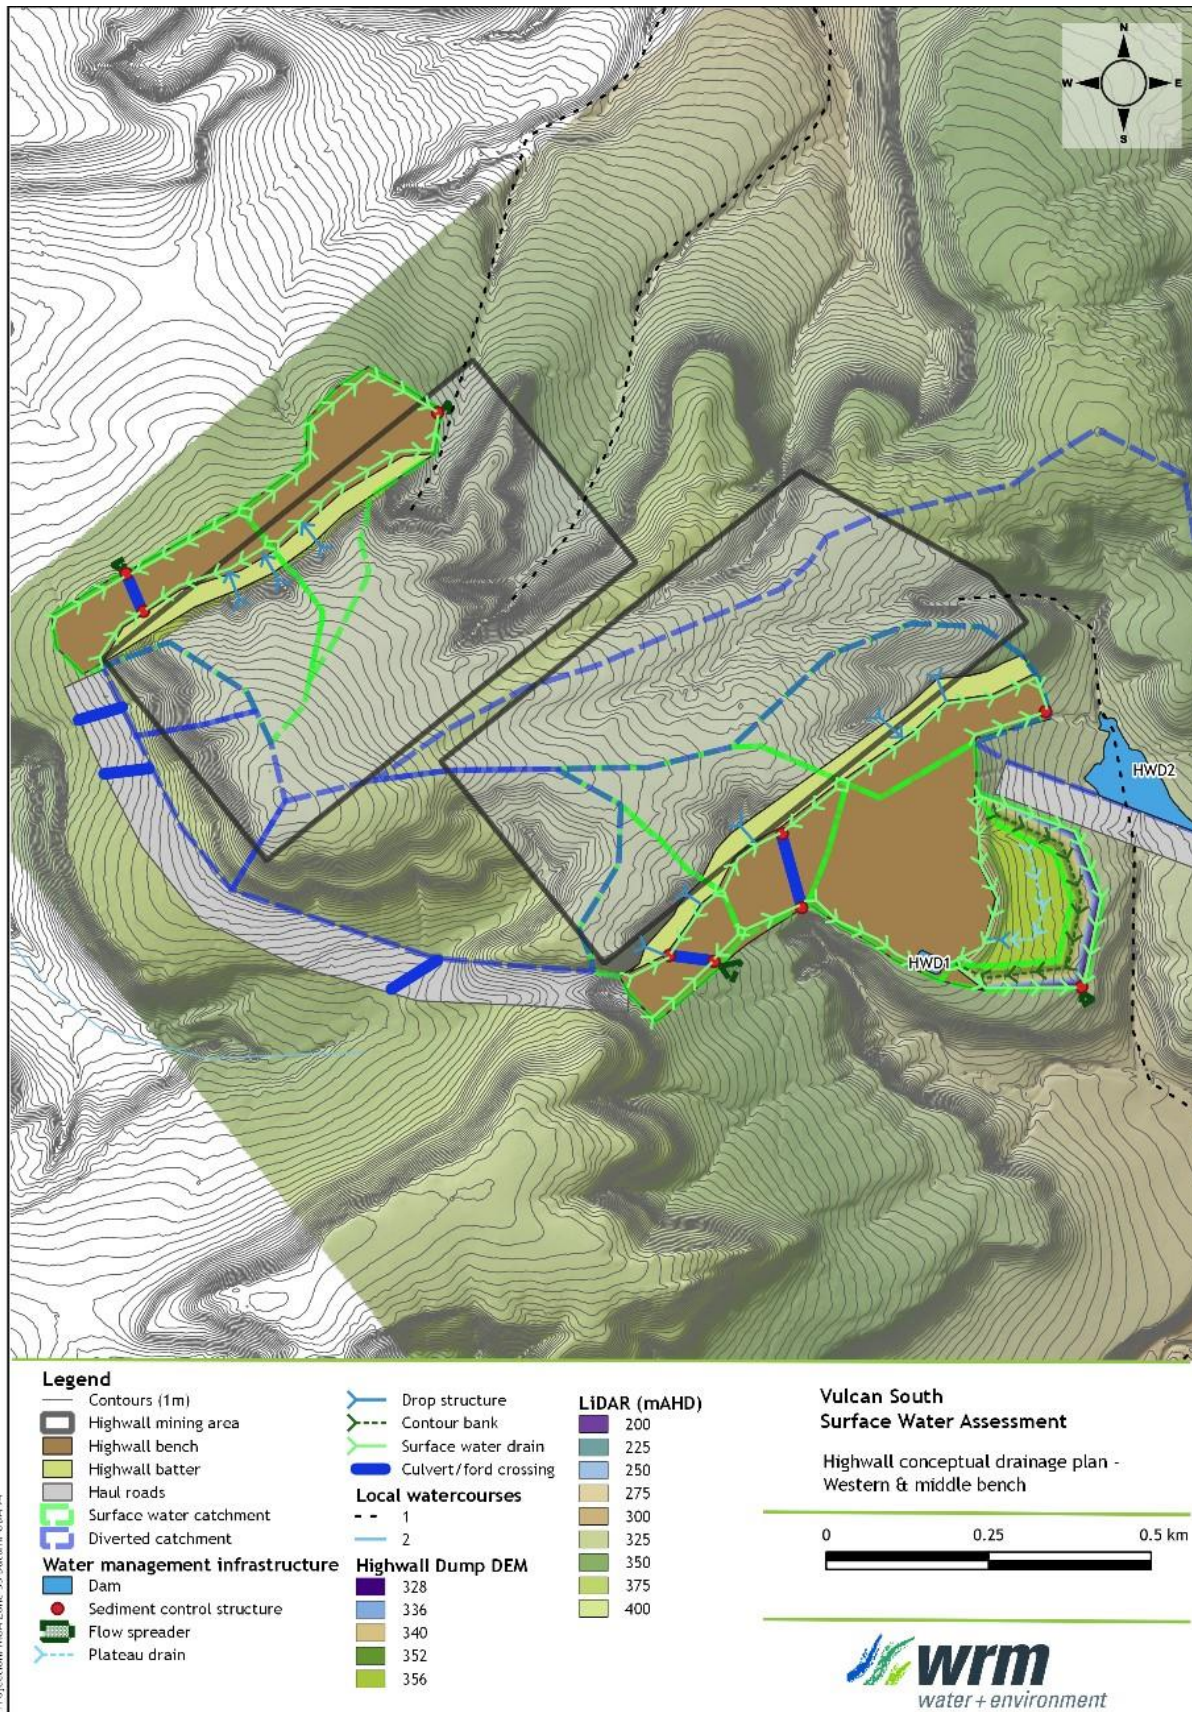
Highwall conceptual drainage plan – western & middle bench
